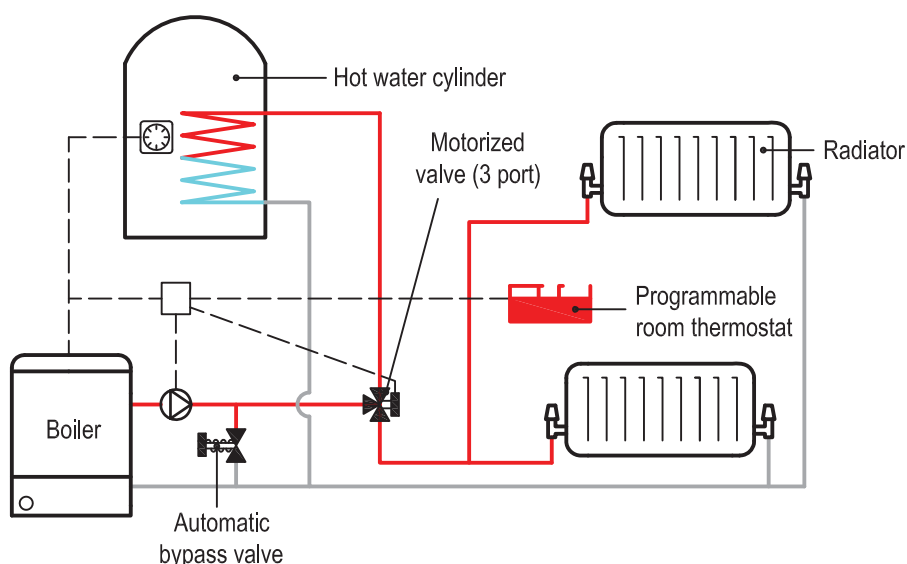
Example of a possible schematic arrangement for gas/oil boiler in single heating zone using one three port motorised valve.
